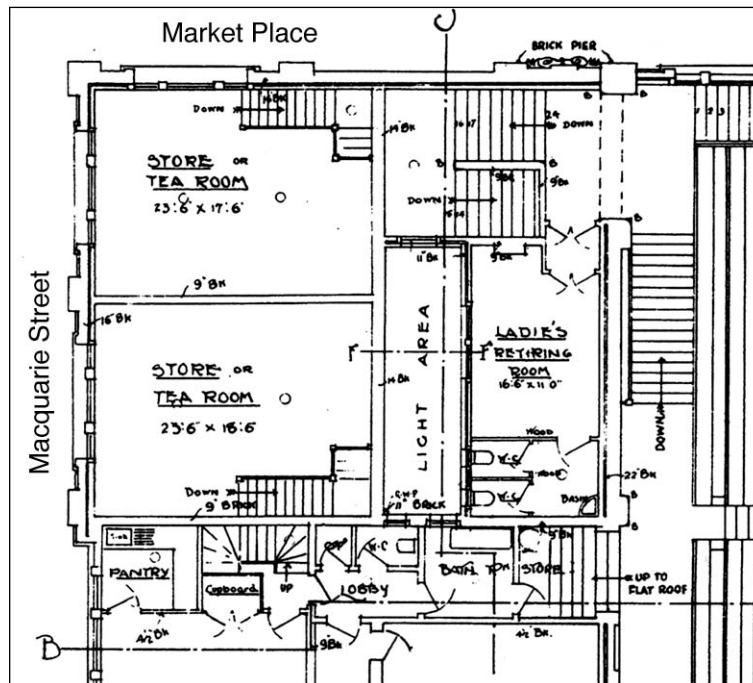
RAIA office as shown in the 1914 plan — marked as Store or Tea Room (HCC Drawing A7³).
